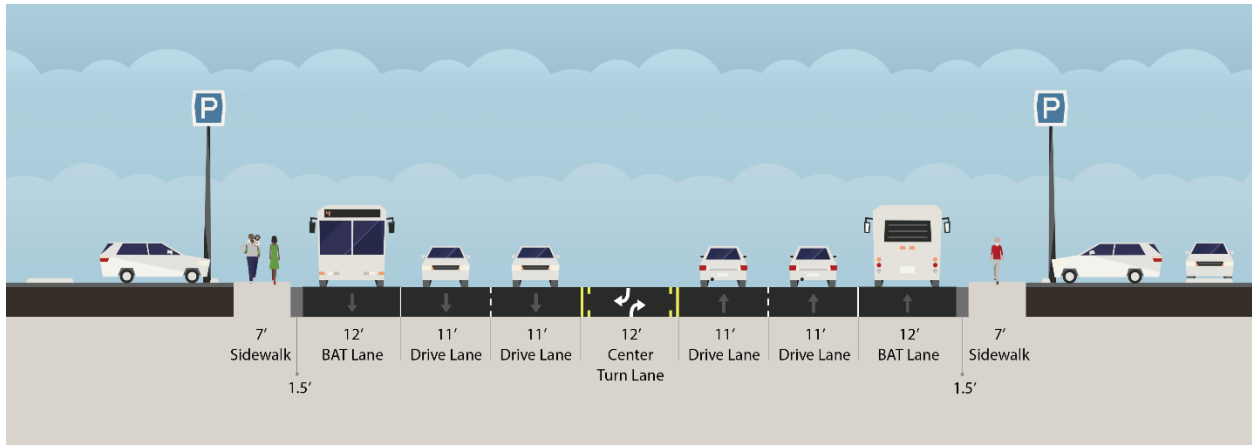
Existing Cross-Section – 100 ft Right-of-way (Source: Streetmix)
